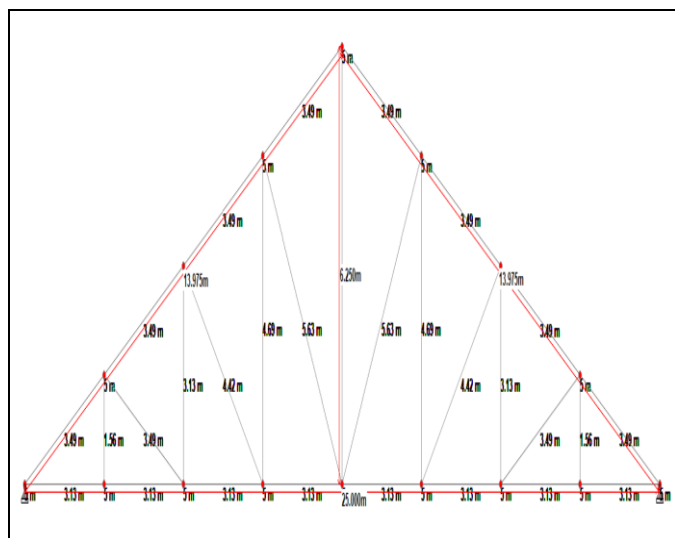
2-D Model of Steel Truss by using Tube Section
